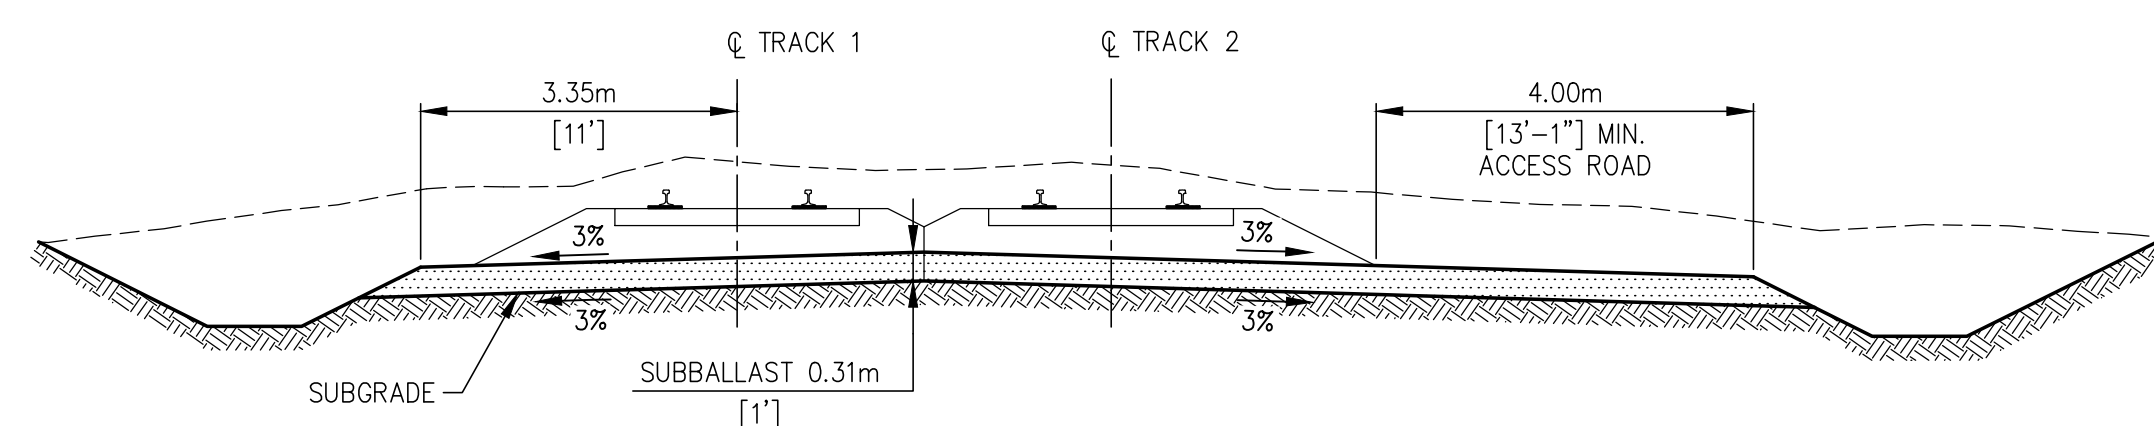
FIGURE IX - TYPICAL ACCESS ROAD SECTION
